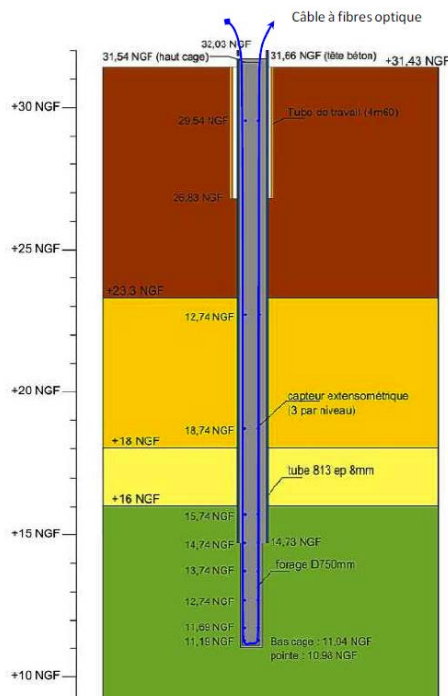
Soil profile and instrumentation details, closed-ended pipe pile (dimensions in m)
